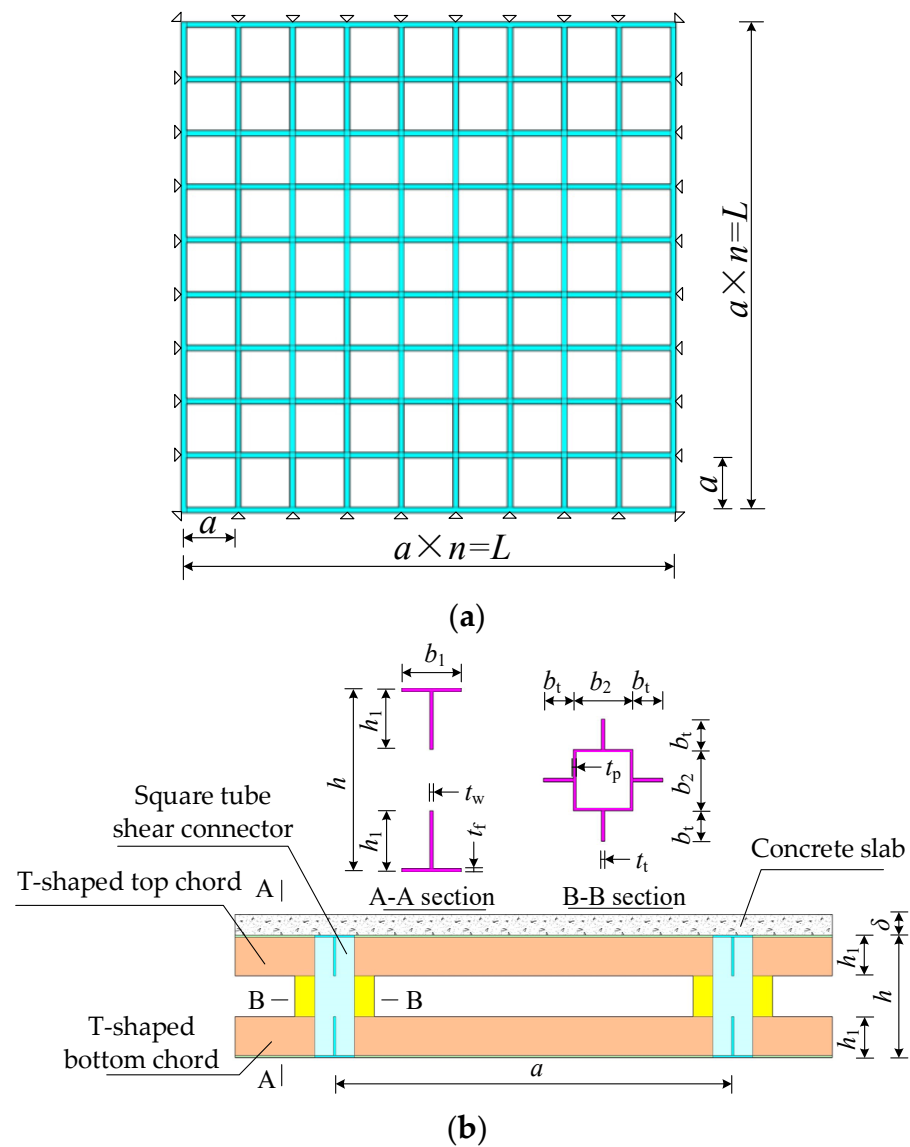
Structural size diagram: (a) plane layout; (b) structural details.
